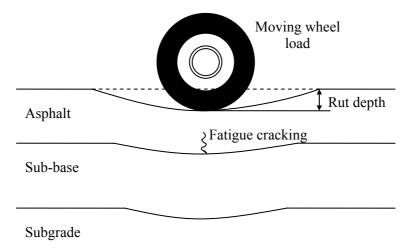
Failure mechanism for bituminous pavement structure
